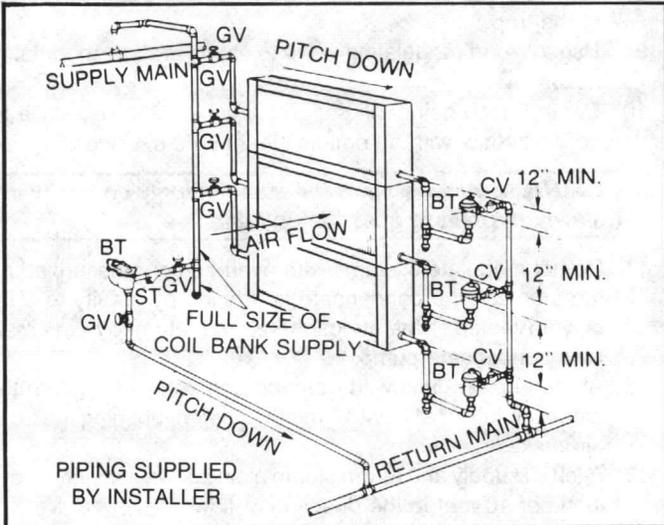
Typical Piping for Type A Steam Coils, High Pressure Horizontal Tubes for Horizontal Airflow
